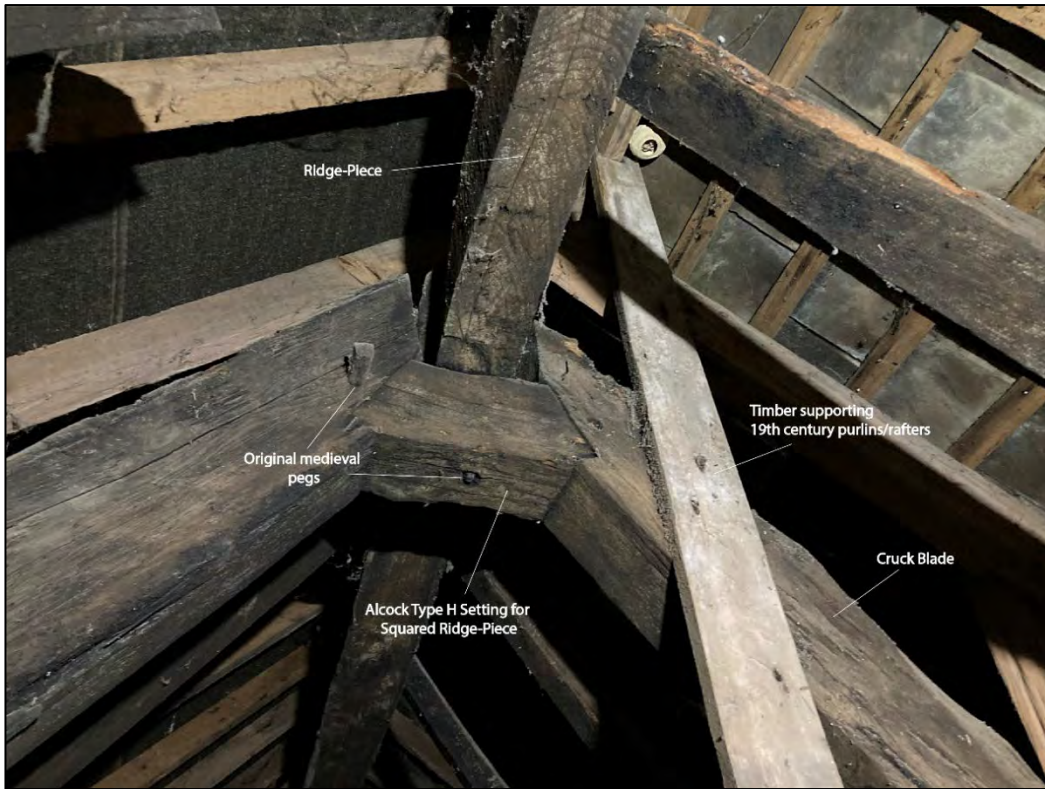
Hall House roof space. Alcock Type H Setting for Squared Ridge-Piece.
